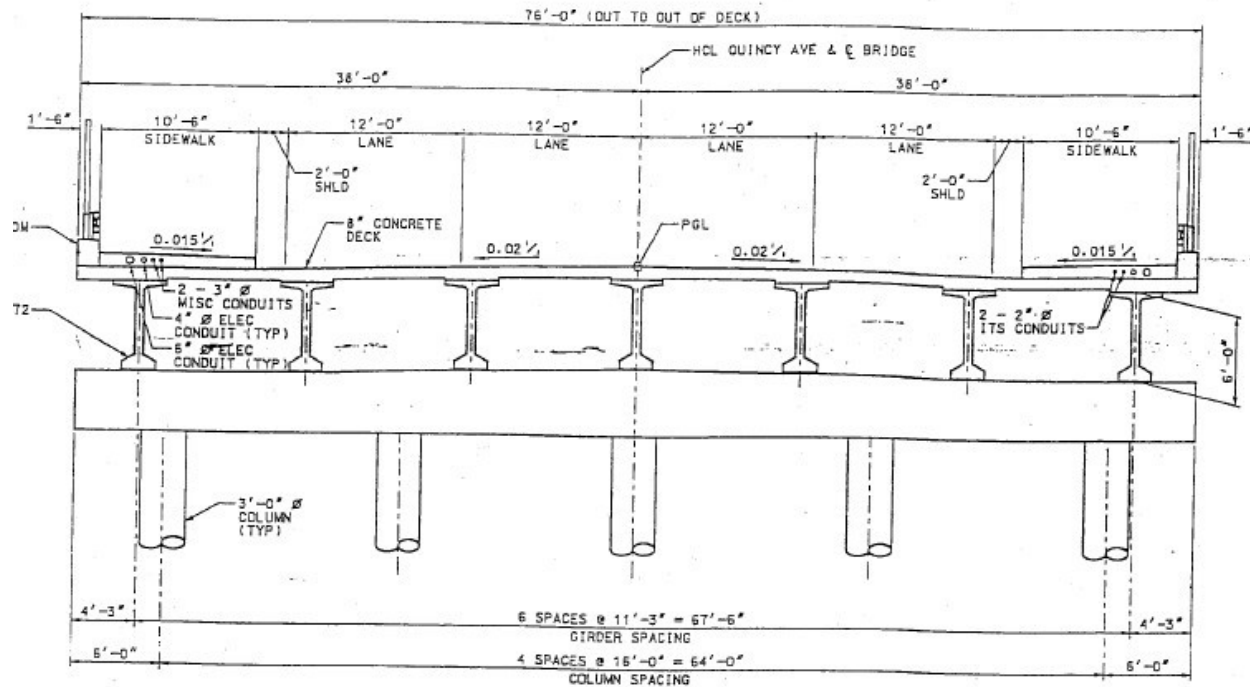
Section View of Quincy Avenue over I-25 and LRT
